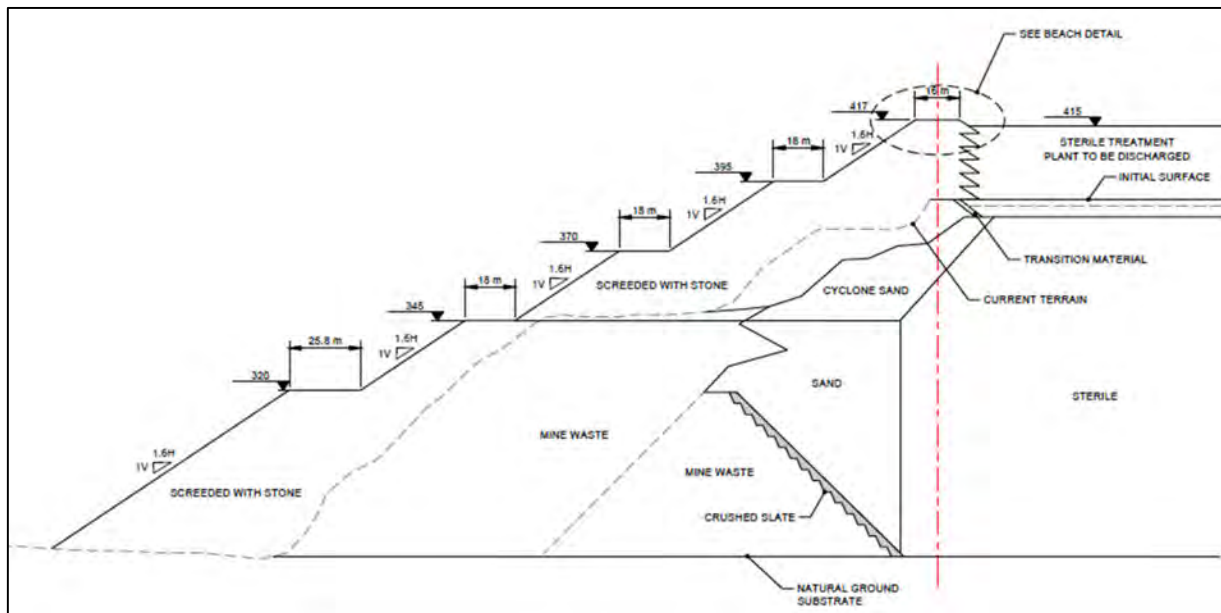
Typical Cross Section - Aguzadera TSF to Final Planned Elevation (Eptisa, 2021).
